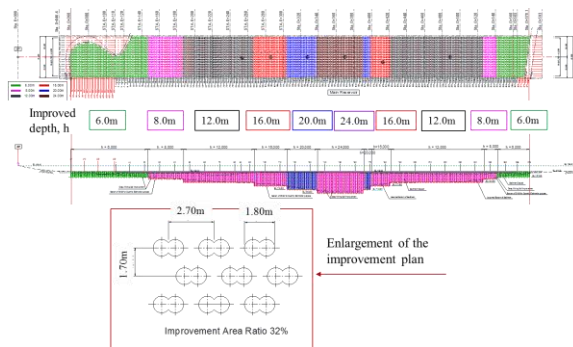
Plan view and longitudinal profile of the soil improvement work in closure dike A.
